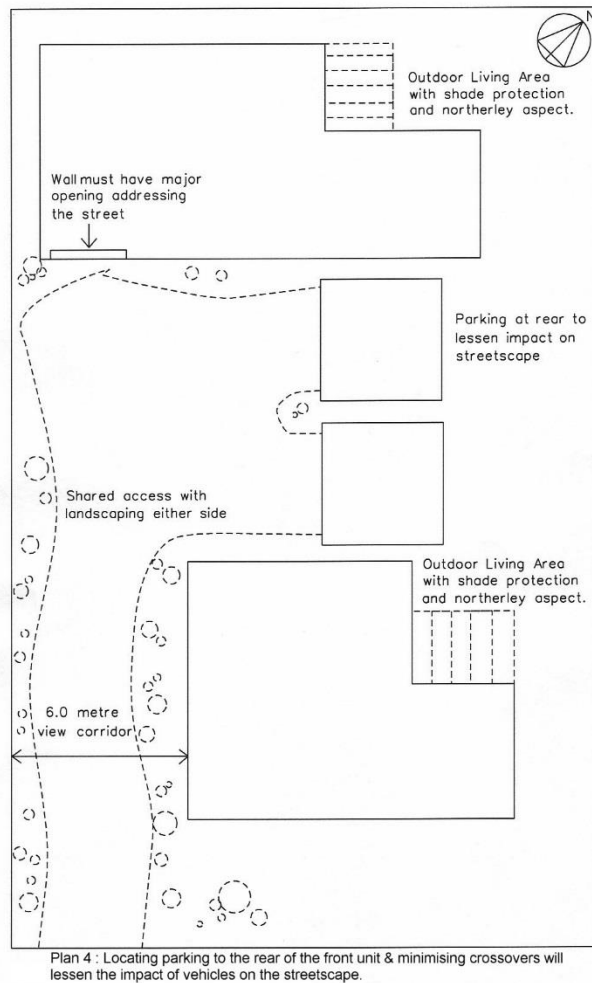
Plan Illustrating Design Intent of Clause 5.7.3(c) of LPS 15
